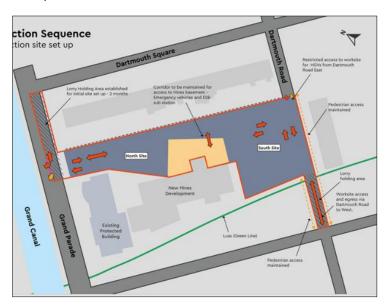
Charlemont Station Construction – Site Access and Spoil Removal
